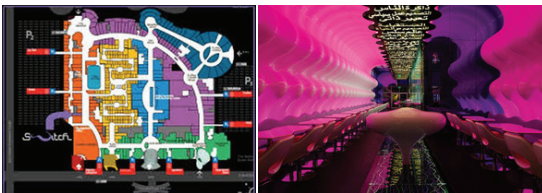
and 5. Switch Restaurant Plan View (URL-4) and Indoor Appearance (URL 5)
